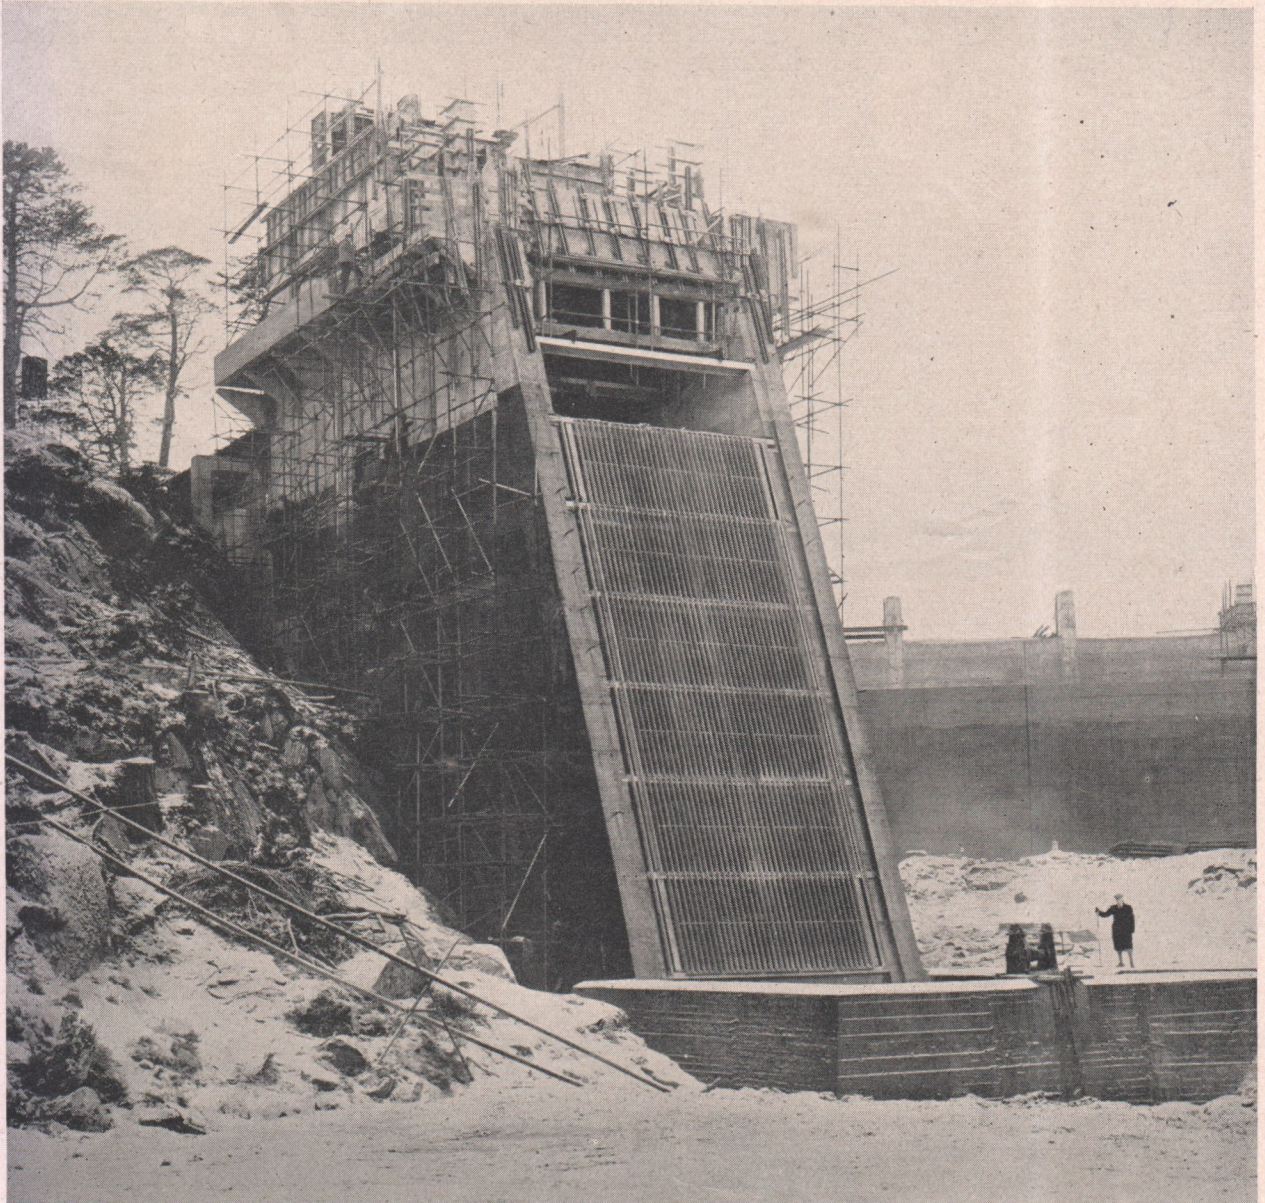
Fasnakyle tunnel intake structure, showing the gatehouse under construction. Benevean dam can be seen in the background
